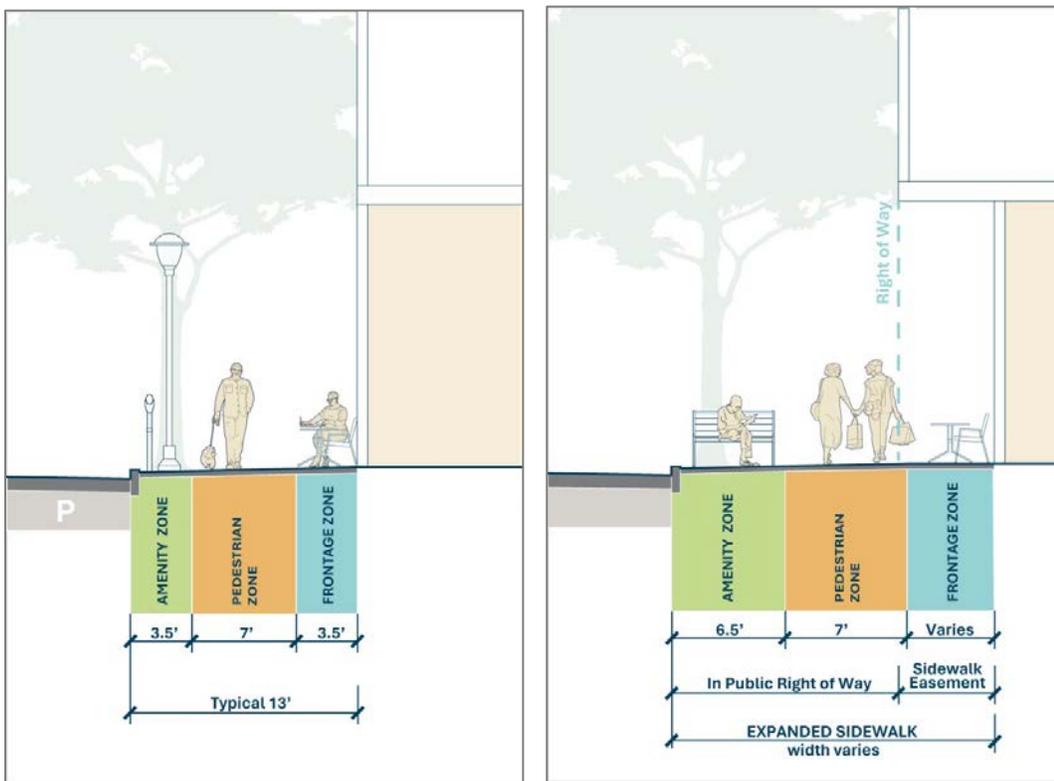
Left: Section C – Outdoor seating in the right-of-way. Right: Section D – Sidewalk expansion
